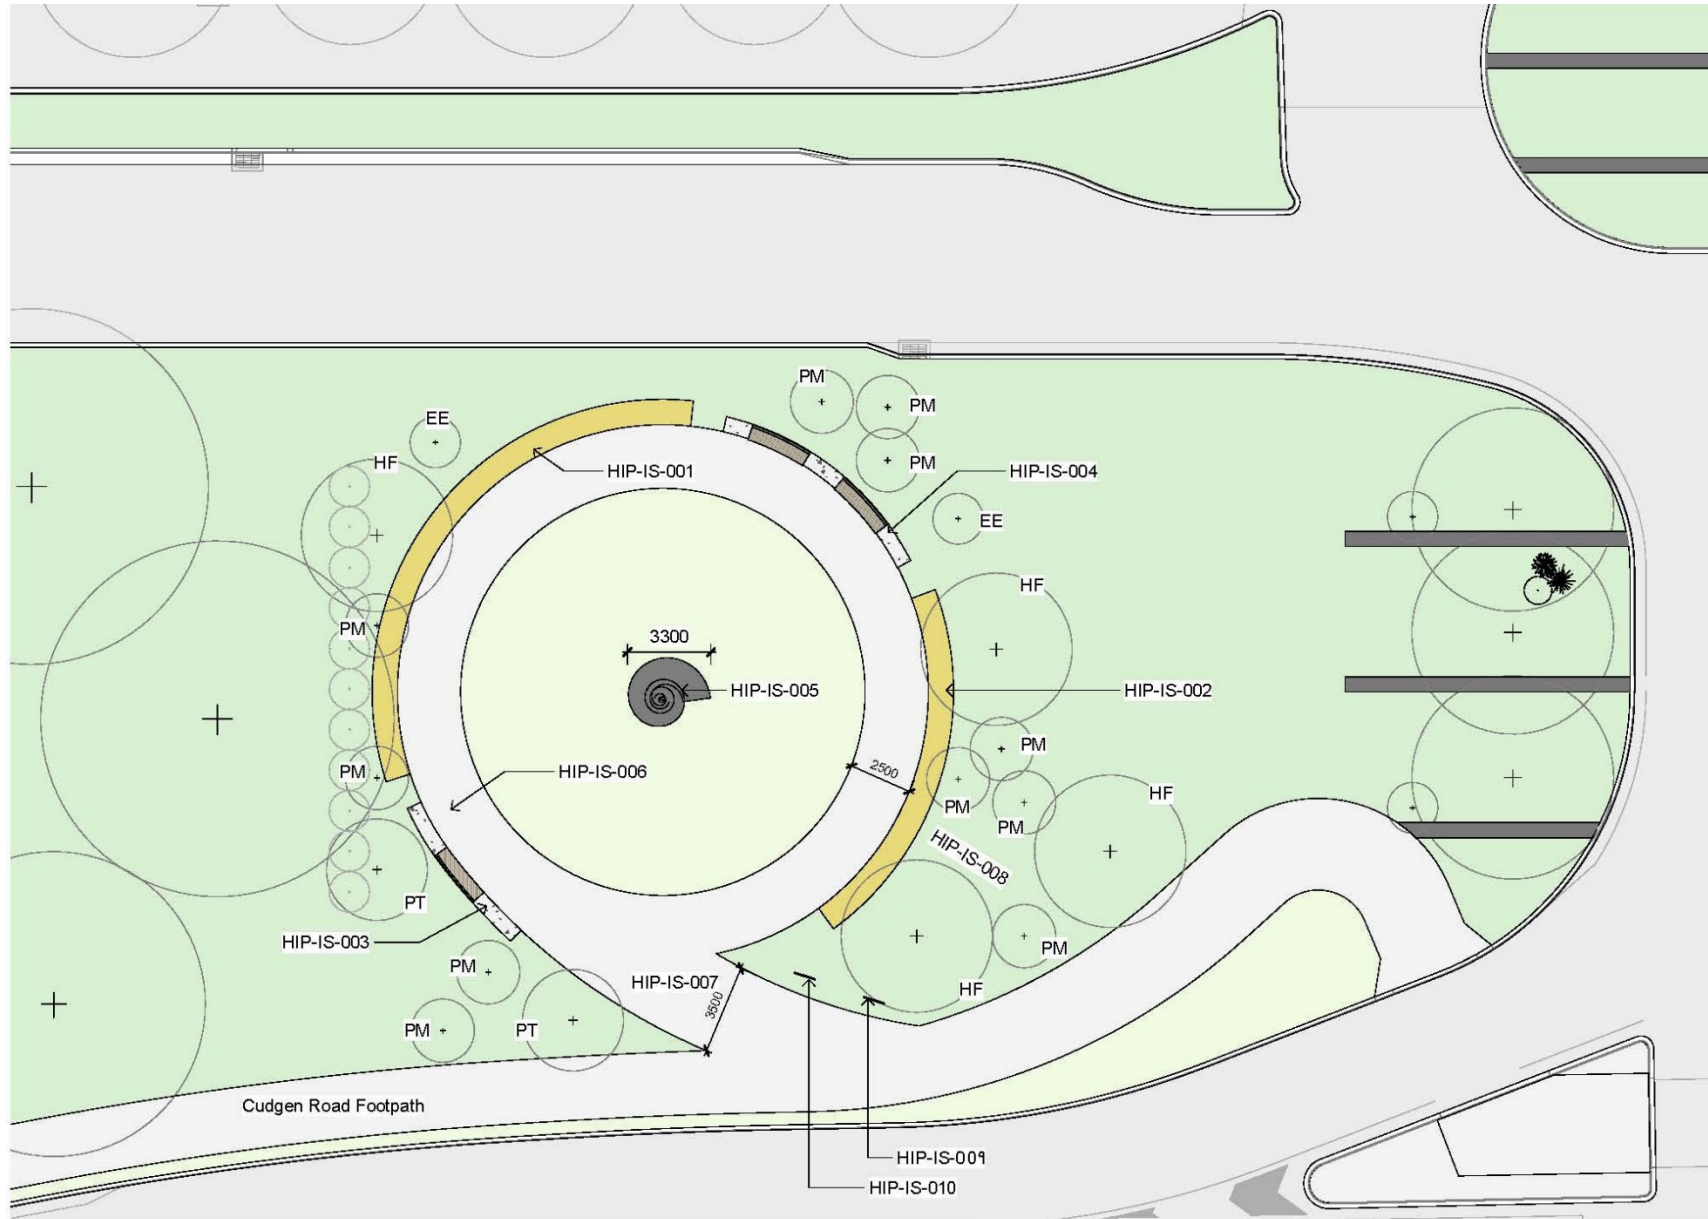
Sketch plan of layout of ASSI interpretation space: see 4 for reference (Source: Niche and Turf Design)
